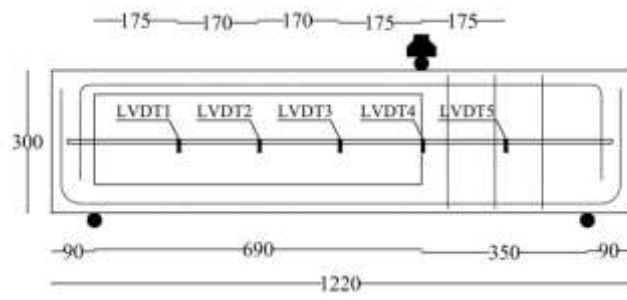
Beam configuration, test setup and position of the LVDTs (dimensions in mm)
